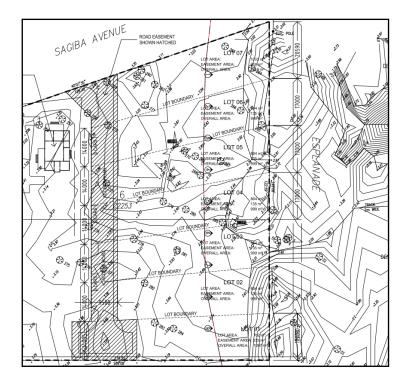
Extract of the Reconfiguring of a Lot Layout Plan
